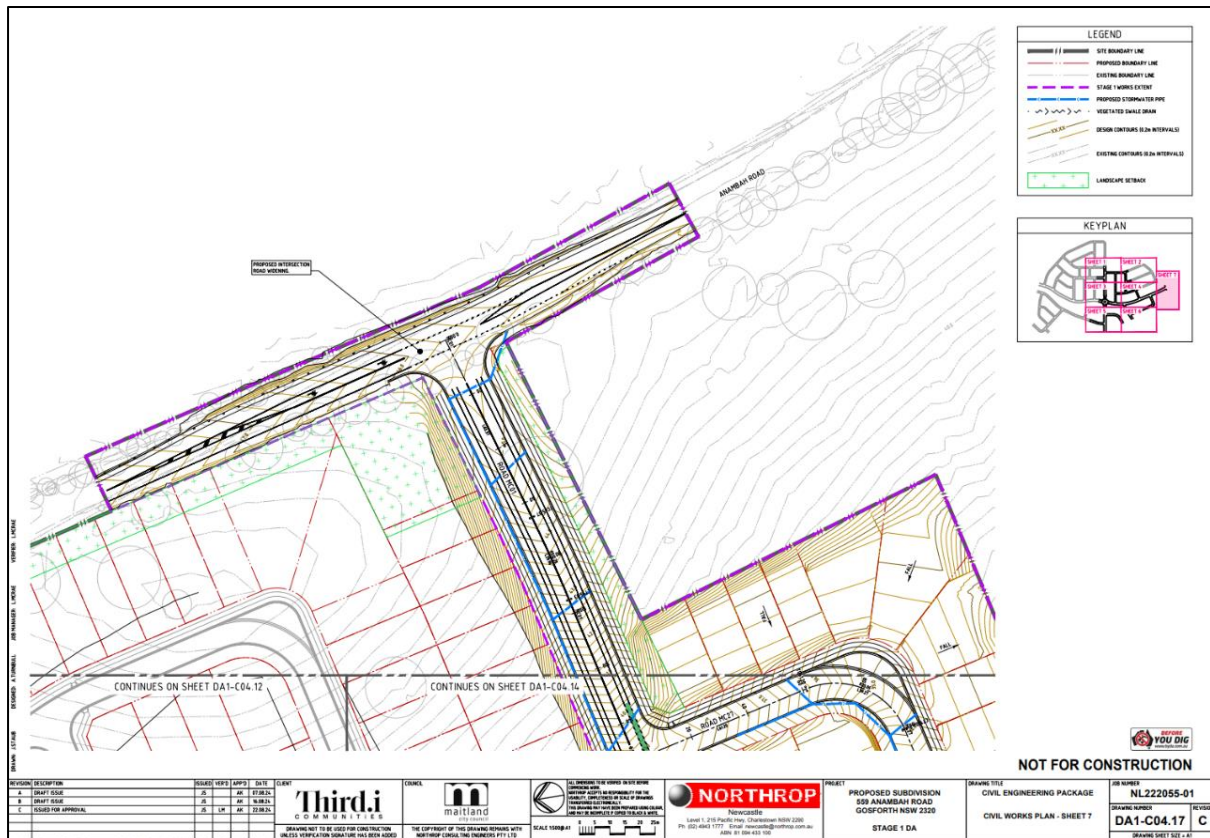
Anambah Road Intersection Detail. Source: Northrop, August 2024
